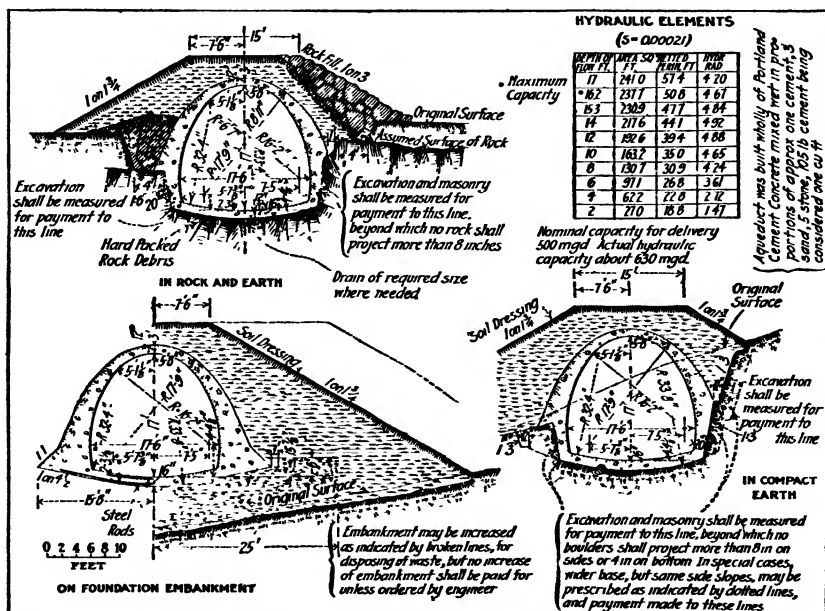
Catskill aqueduct. Standard types, open cut and embankment.
